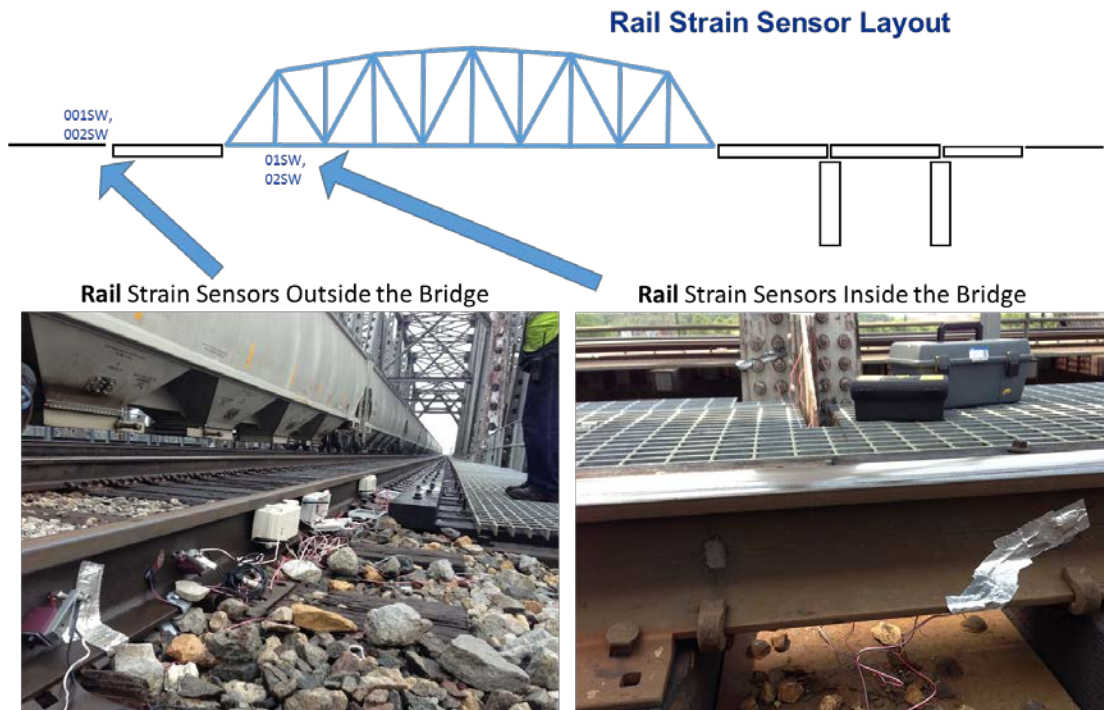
Layout of the rail sensors at the bridge and vicinity
